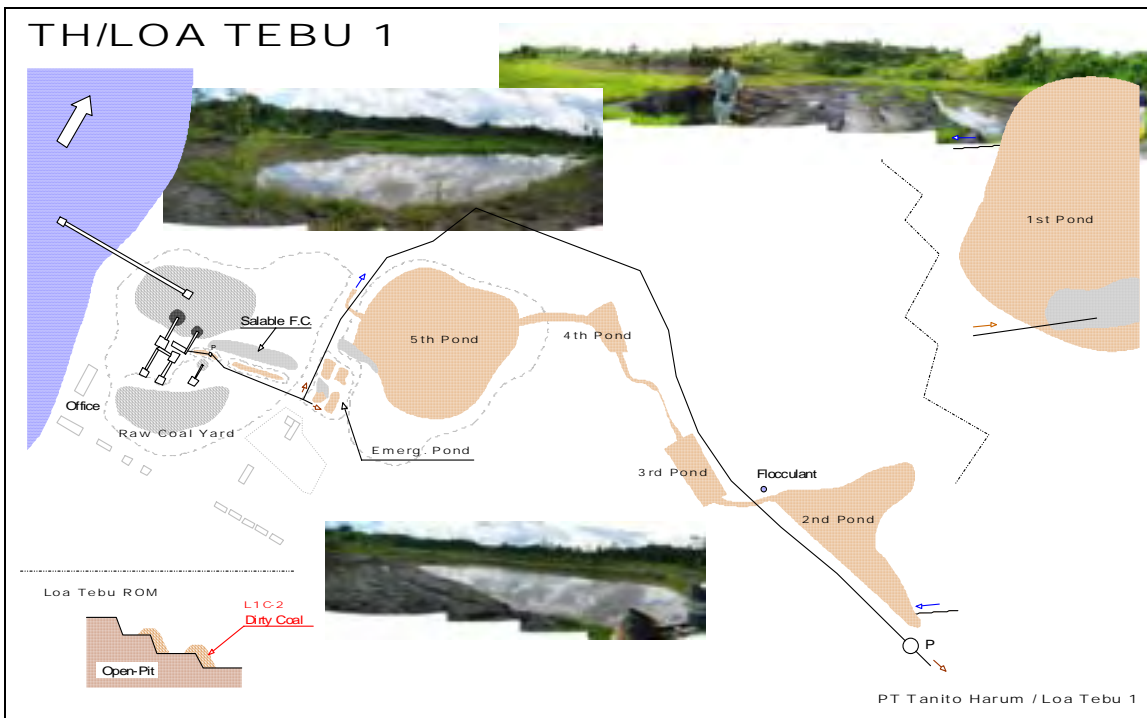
Settling Pond Layout / Loa Tebu 1
